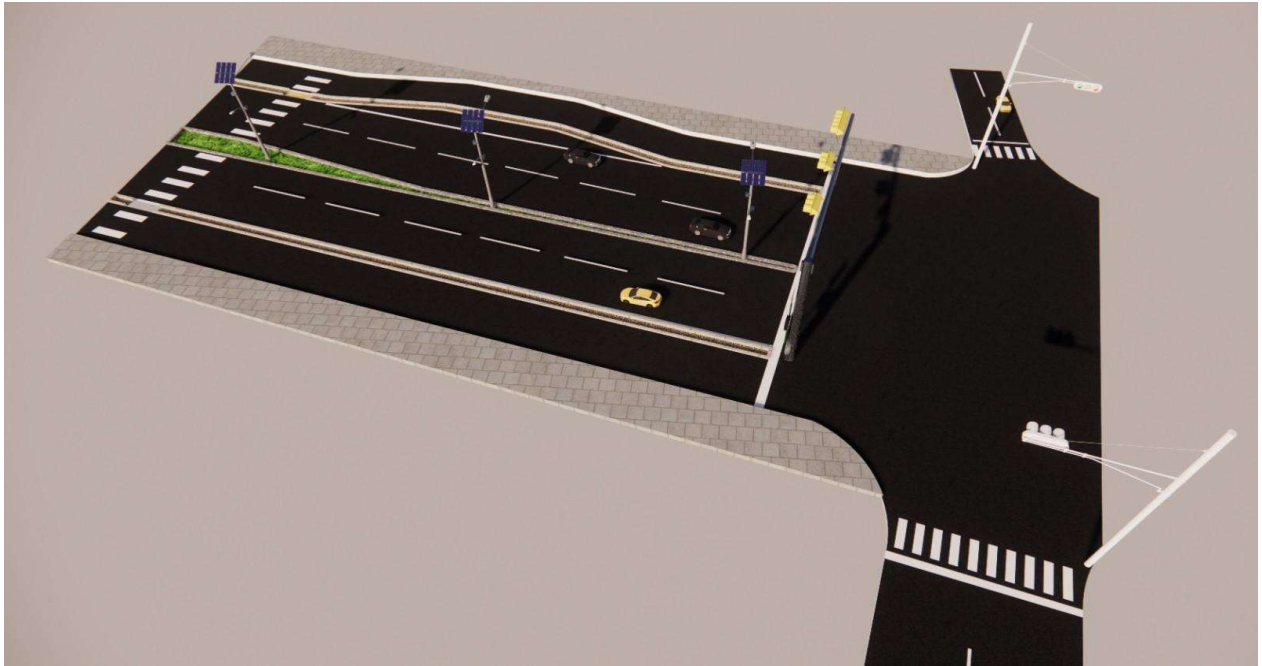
3D Sample Image of West Approach of Chardobato Intersection made using Sketchup
